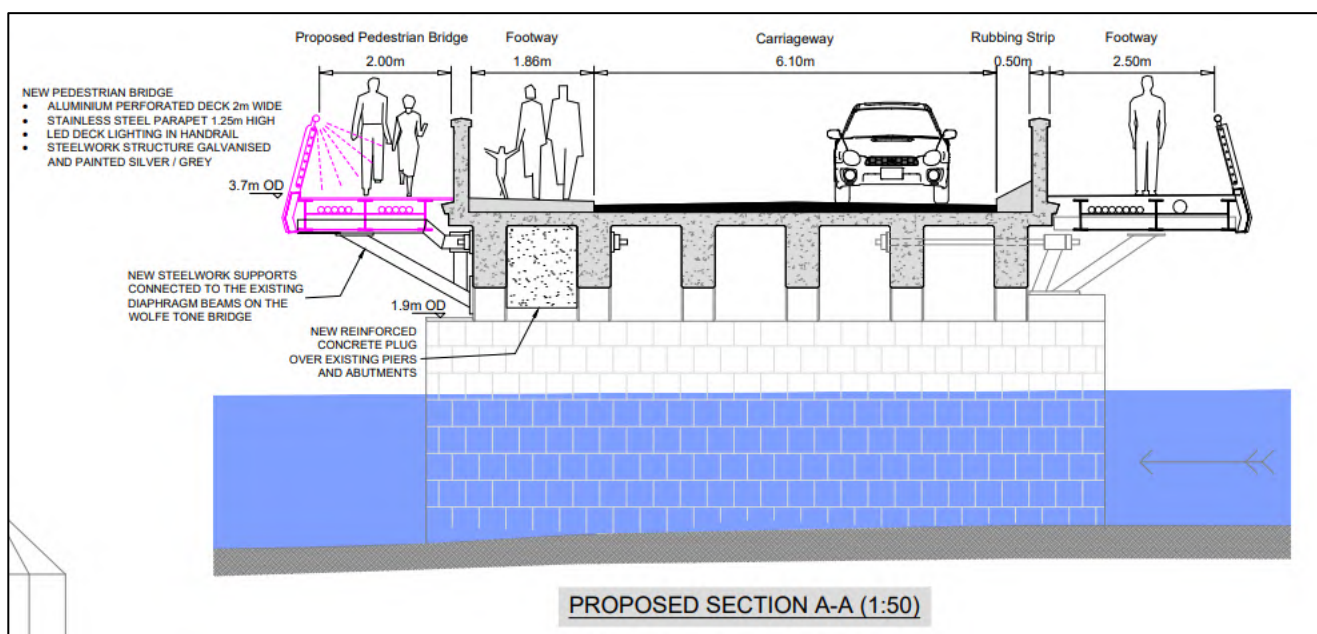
Cross-Section of Proposed Pedestrian Bridge
